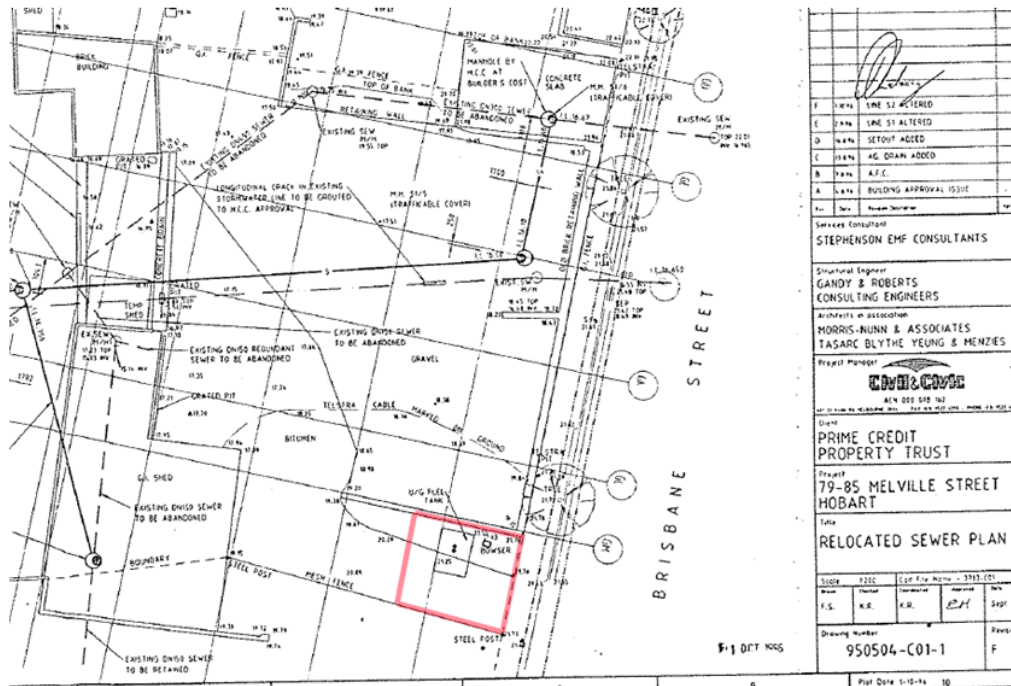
Civil works plan c1997 showing the site of a bowser and underground tank on the Brisbane Street Frontage.
